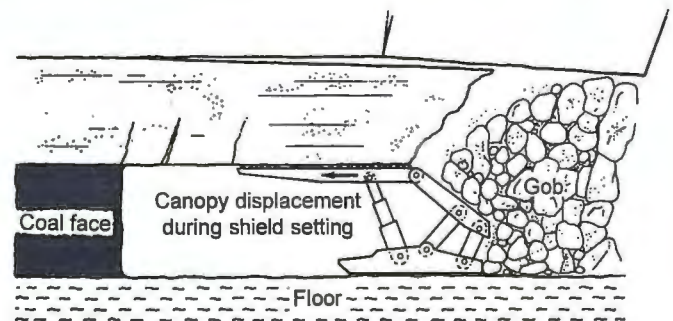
Horizontal movement of canopy toward longwall face as the shield is set against the mine roof.
